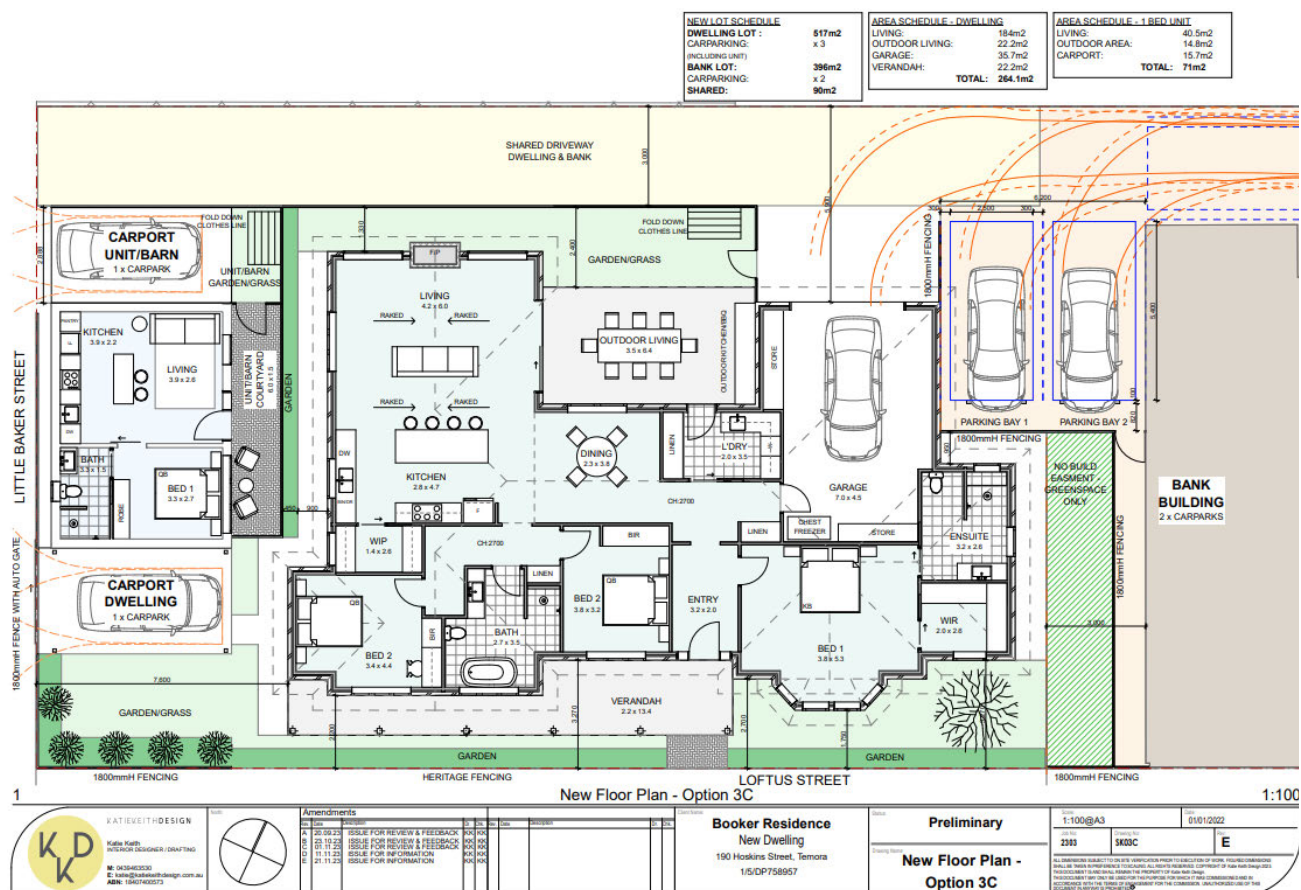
Original Site and Floor Plan Prior to EE Comments (Source; Katie Kieth Design)
